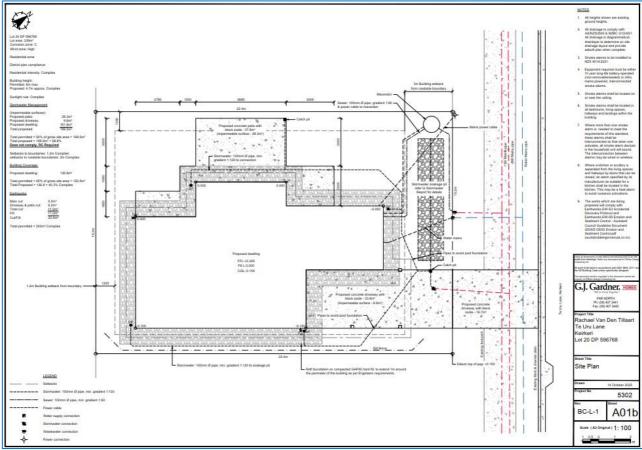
Site Plan (Source: G.J. Gardner Homes)
